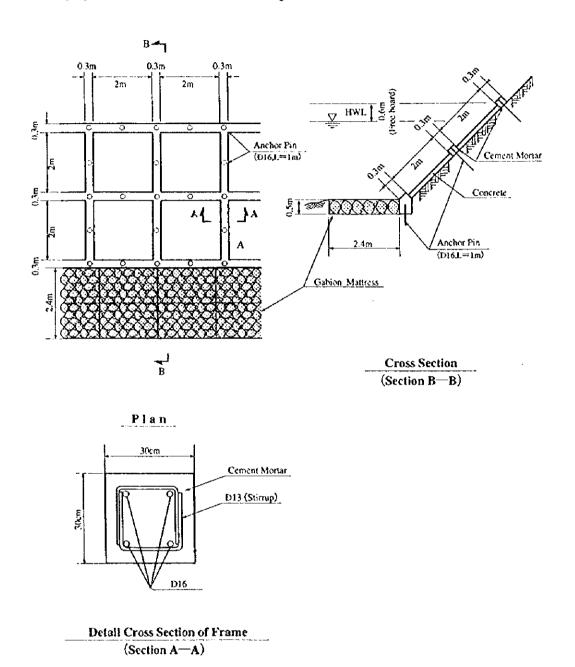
Typical Plan and Cross Section of Slope Protection
